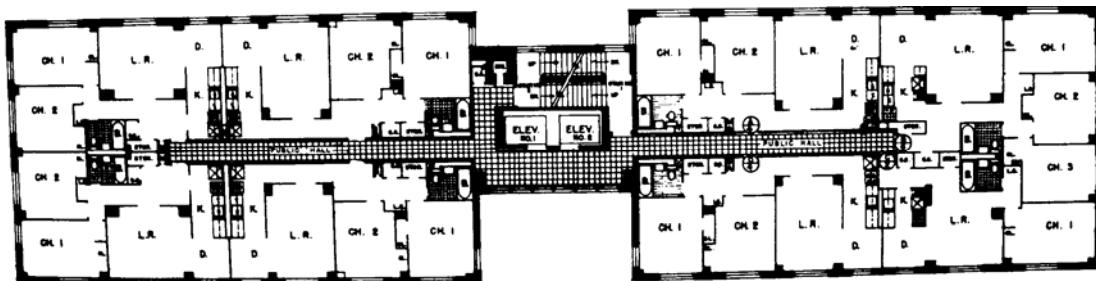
Floor plan of high-rise slab blocks in Van Dyke project
